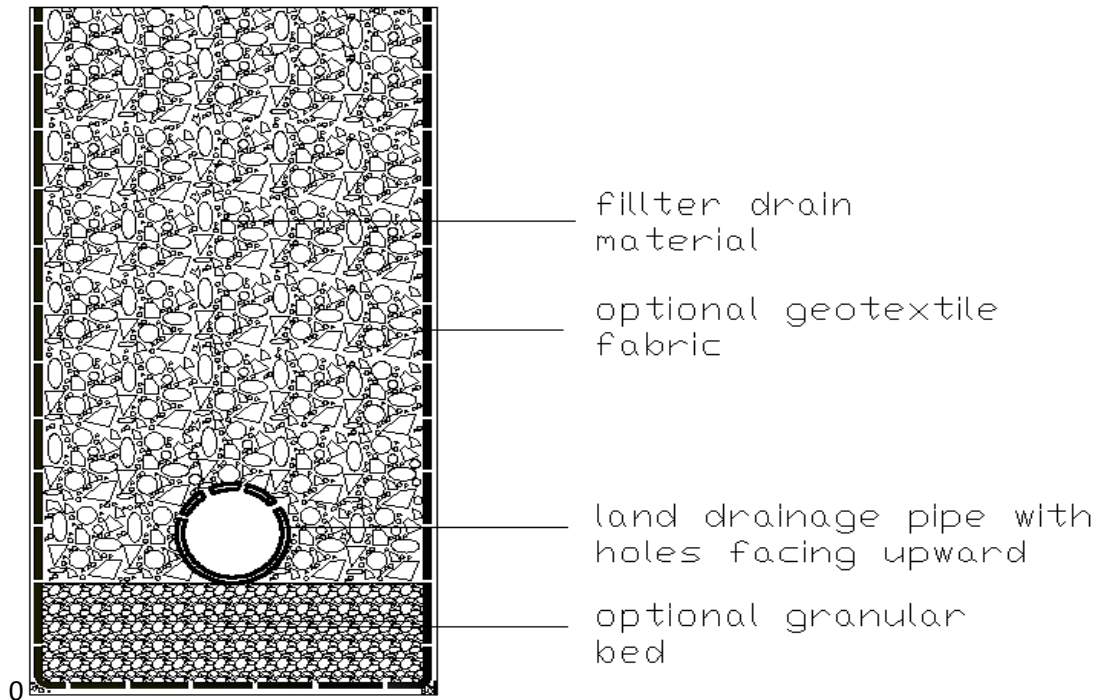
Land drainage perforated pipe behind a retaining wall.
